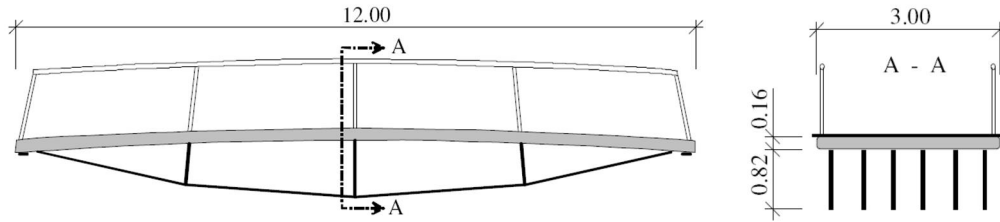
Prestressed pedestrian bowstring bridge at the EMPA site [121]
